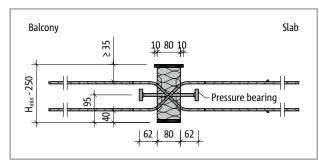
Schöck Isokorb® T type Q-VV: Product section
